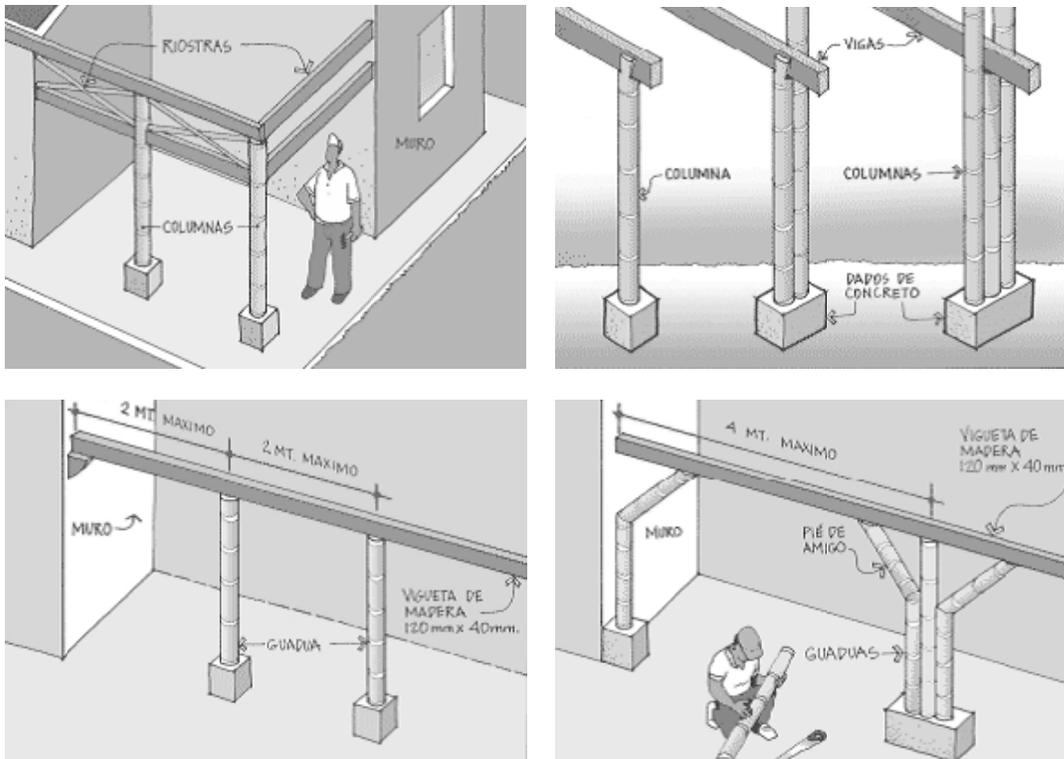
Bracing between columns, adaptability of column size dependent on load, span, proportions (AIS,2001).
